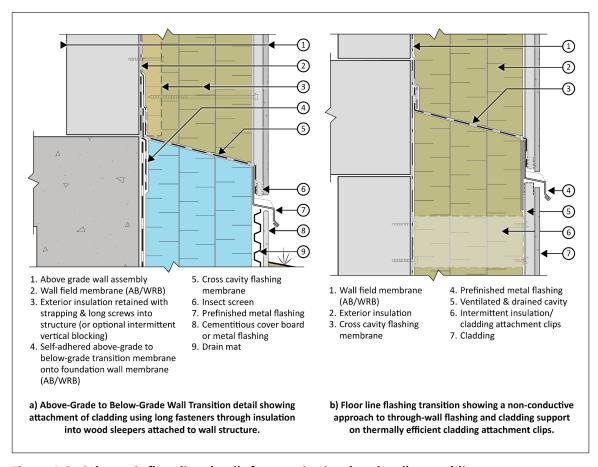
Schematic floor line details for exterior-insulated wall assemblies.
